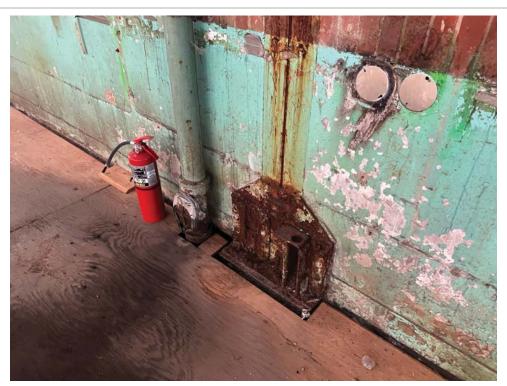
Main Floor – Anchor bolt missing. Column is no longer connected at base.
